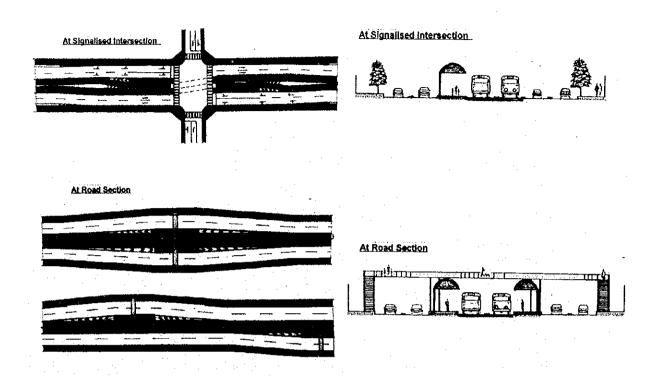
Layout of Bus Stops for Trunk Bus System
